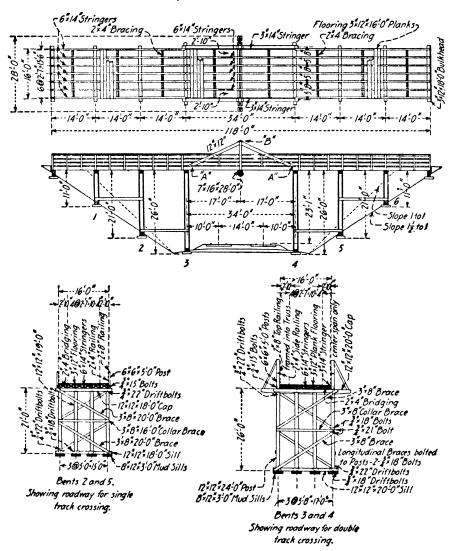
HIGHWAY CROSSING. ILLINOIS CENTRAL RAILROAD.
